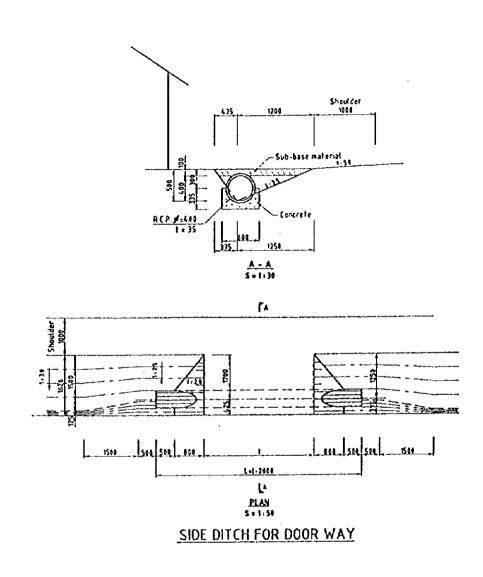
TYPICAL SIDE DITCH FOR DOOR WAY
